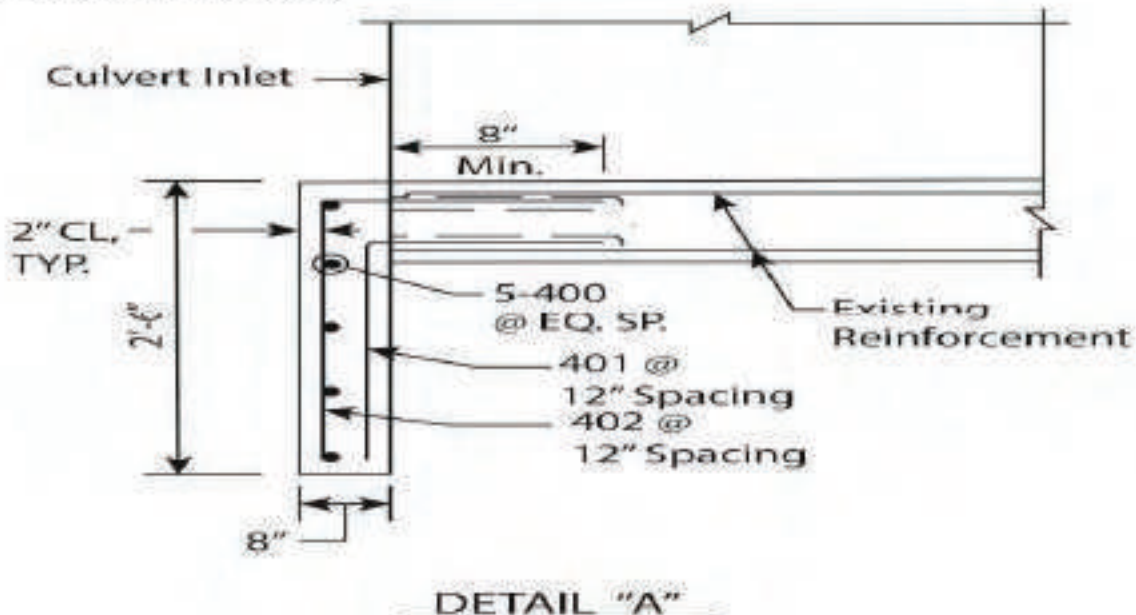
Toe Wall Detail at Concrete Box Culvert (Courtesy of GA DOT)
